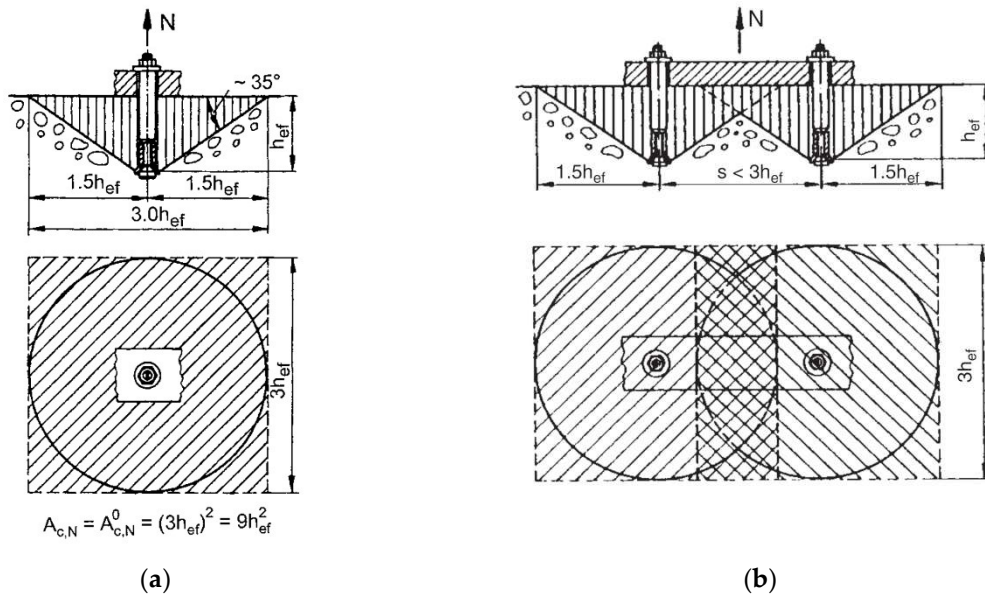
CC method: (a) single anchor; (b) anchor group [1]
